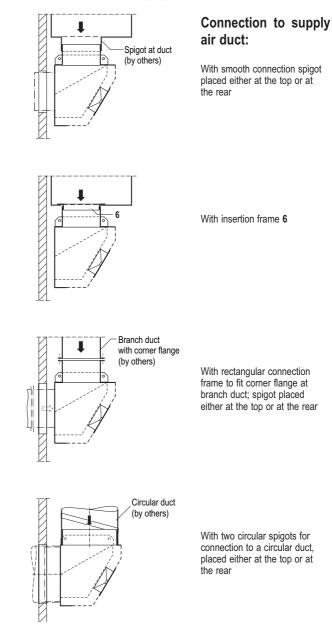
Semi-trapezoidal displacement outlet - Placement and connection types
